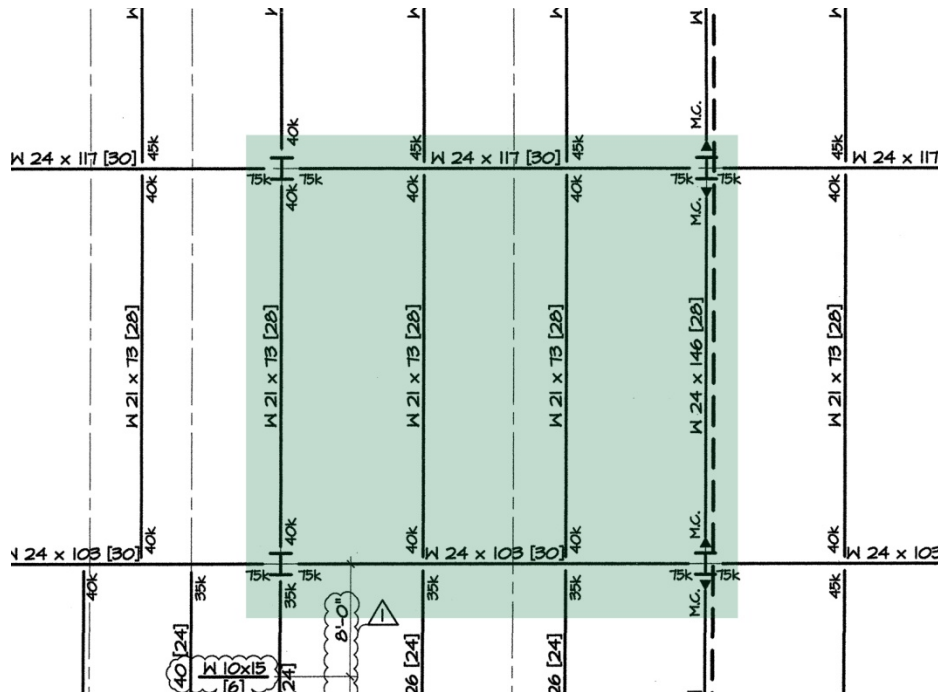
Typical Bay Plan – The typical 30'x30' bay is shown here highlighted in green.
